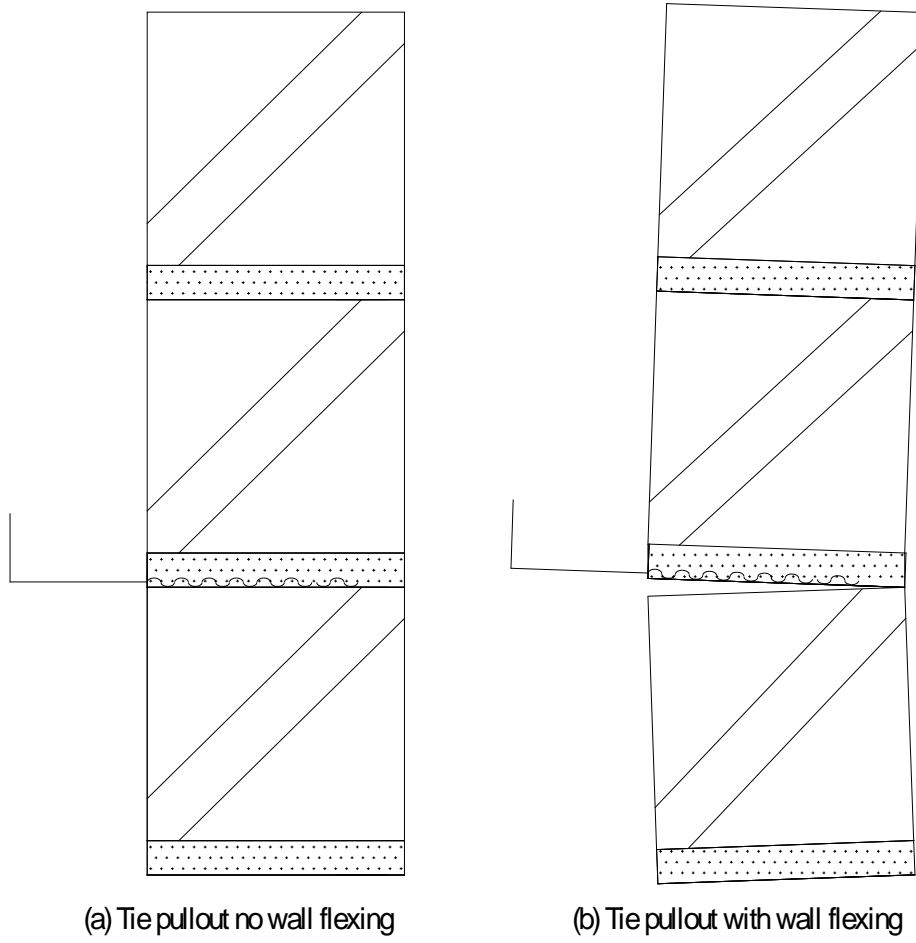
Influence of wall flexing on tie pullout from the mortar bed for dry-bedded construction
